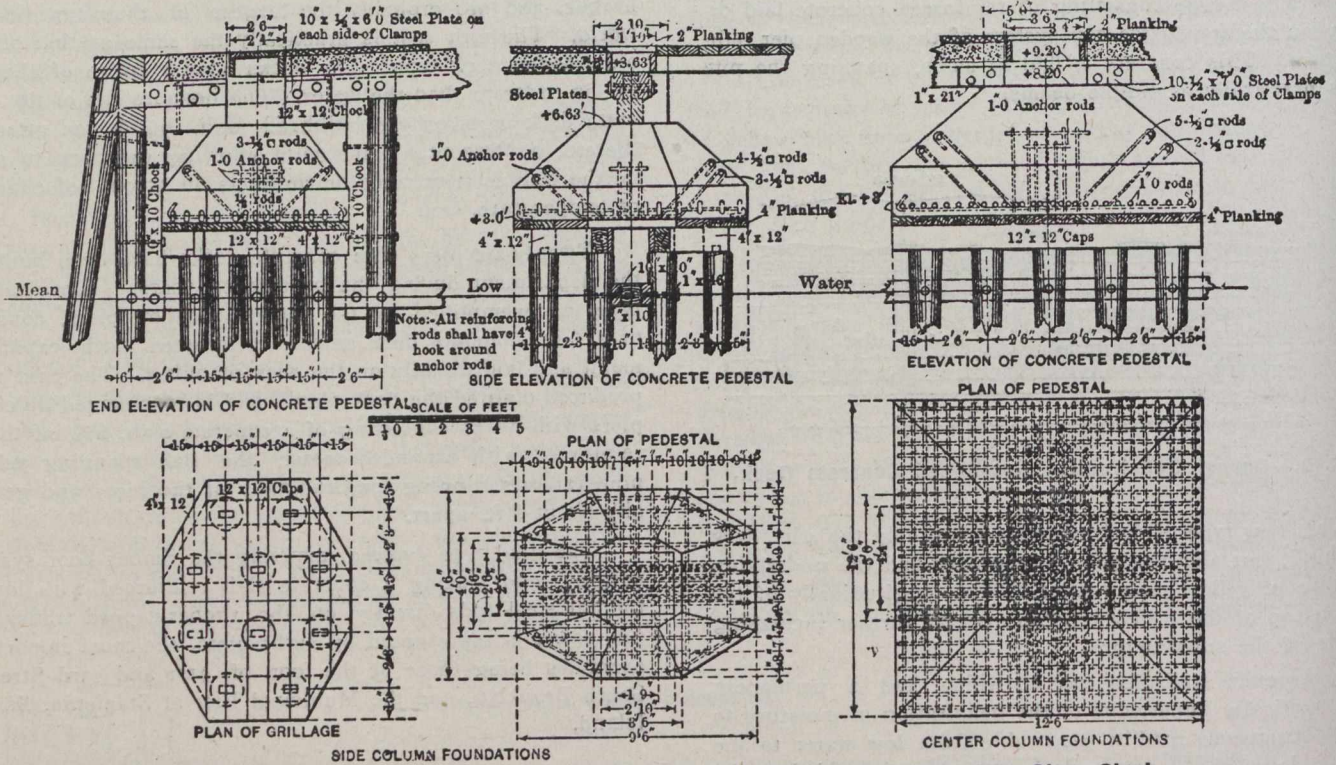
Details of Reinforced Concrete Deck and Column Pedestals, Two-Story Shed.
